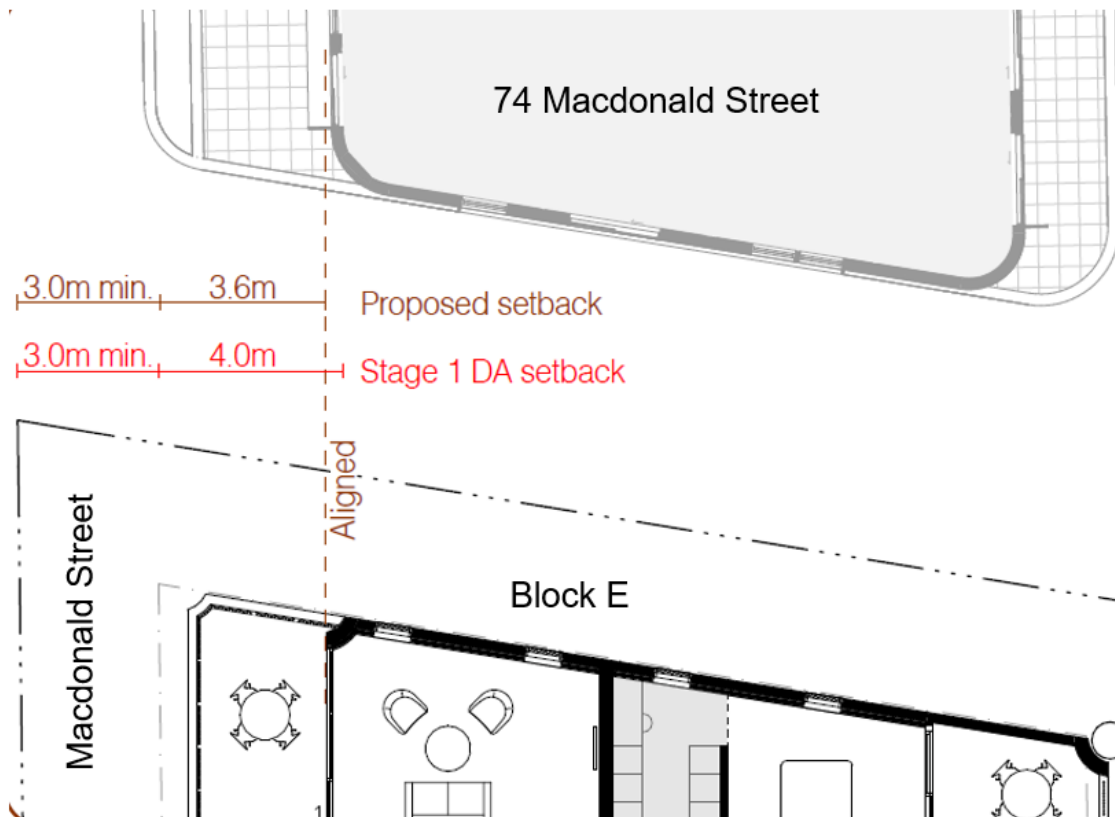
Proposed floor plan - Level 6 of Block E (D/2023/842), depicting aligned upper level setback with 74 Macdonald Street
